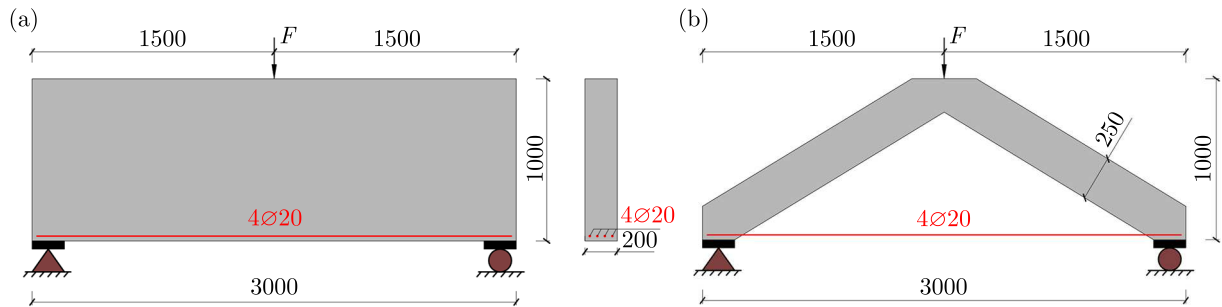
Dimension and reinforcement layout of two examples (unit: mm): (a) short beam, (b) triangular truss
